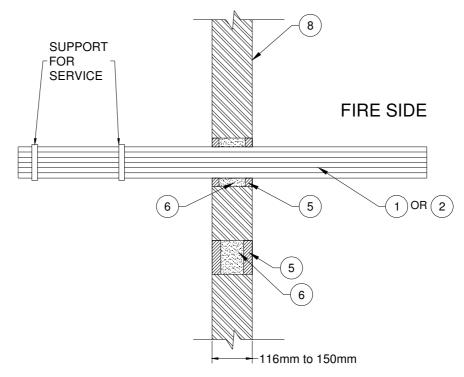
Typical Details for Cables Protected with 3M CP 25WB+ Sealant for Masonry Walls
